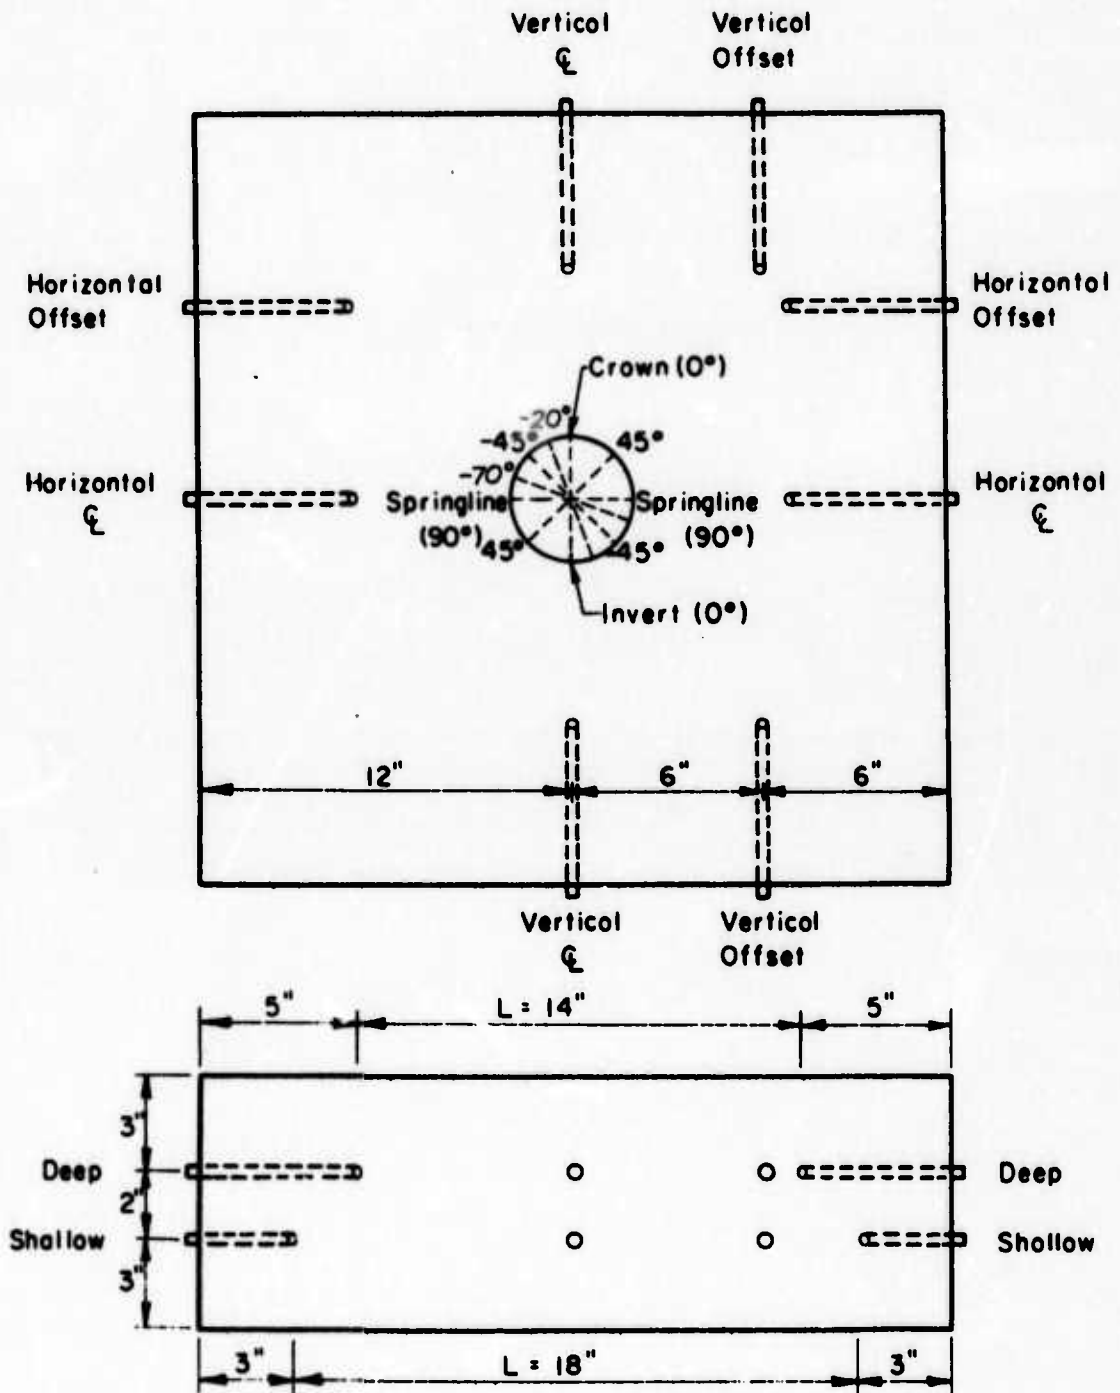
Locations of Extensometers in Jointed Test Blocks (After Hendron et al., 1972)
